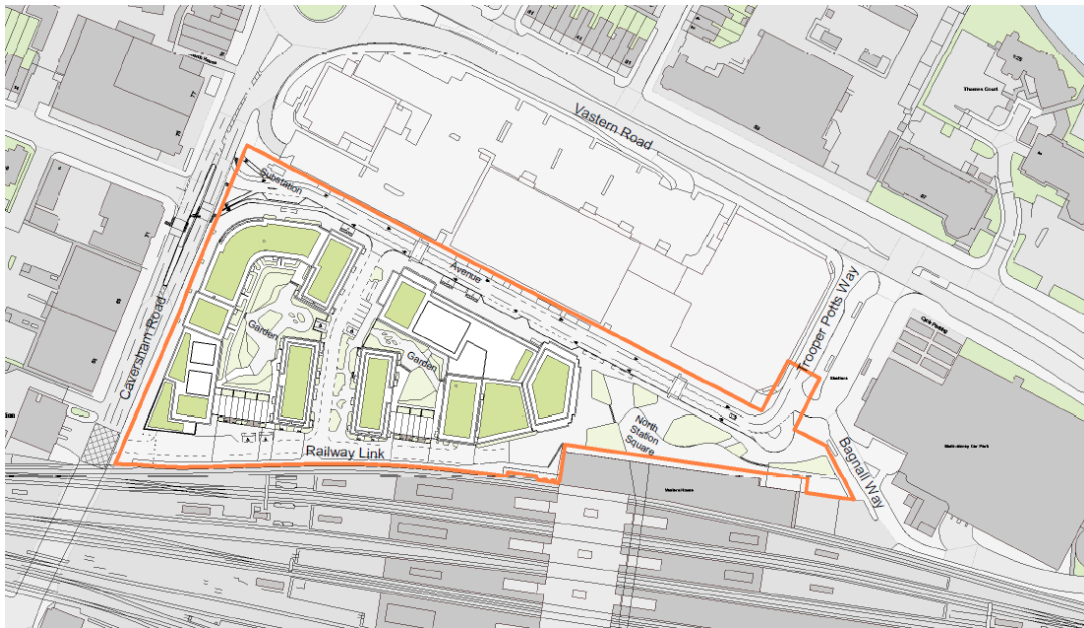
Extract of Proposed Site Location Plan with Application Boundary A11113 C 2 003 Rev P4, as received 22/02/2022
